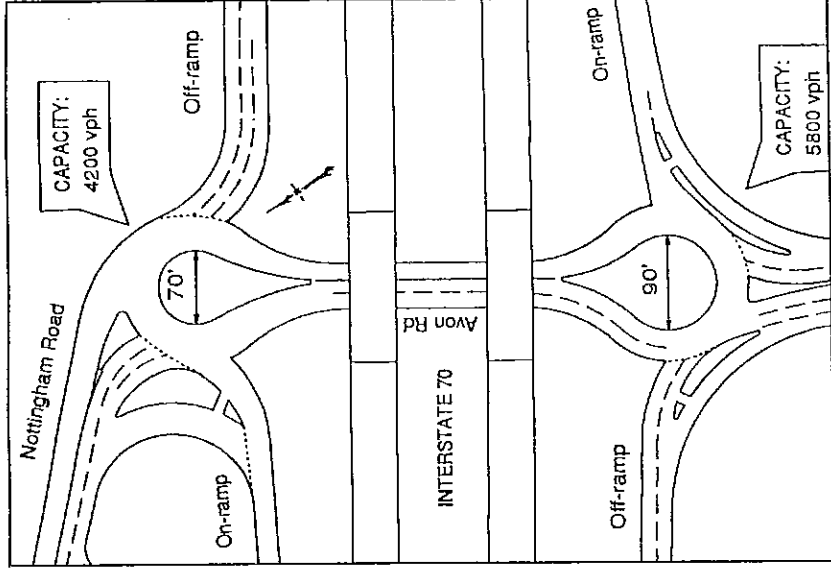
Construction on I-70/Avon Road in Avon, Colo., USA, nine miles southwest of Vail, was completed this fall.
